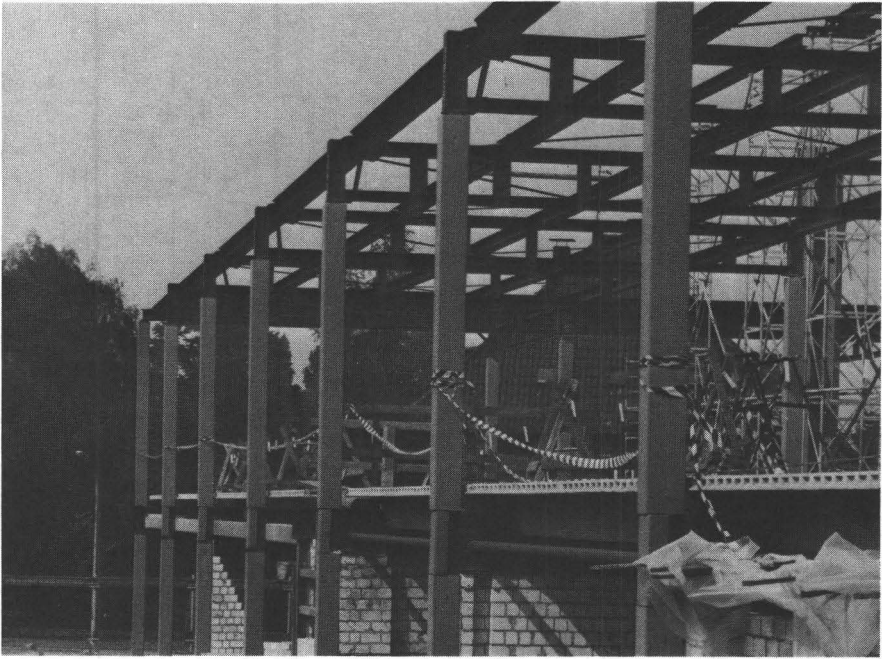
Council House at Bottrop. Concrete-filled supports; F 90 at full load
